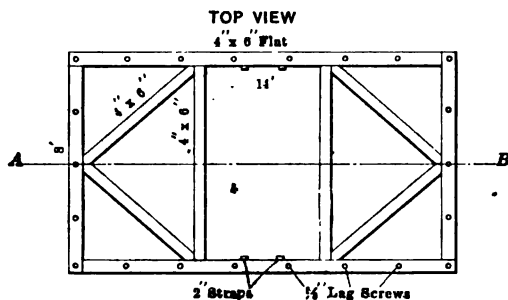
METHOD EMPLOYED IN SINKING AIR SHAFT.
